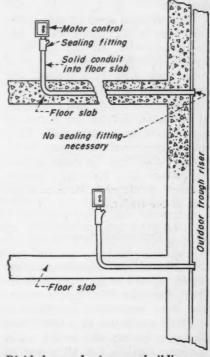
With solid conduit stub extending from control sealing fitting into floor slab, no sealing fitting is necessary at outdoor trough termination.
